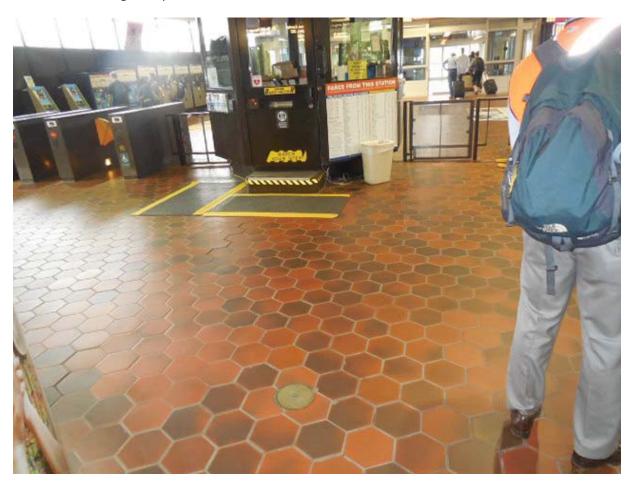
C10 Reagan Airport South – Handholes in hallway to Station Facility Rooms
